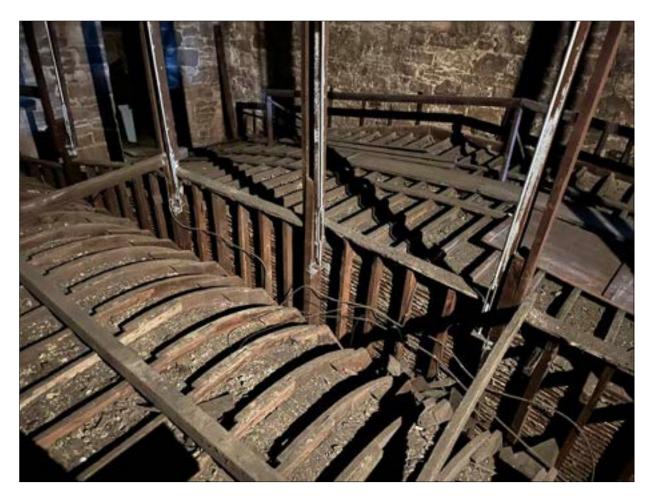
Catwalk over the proscenium arch, where an additional plaster collapse occurred. Concentrated foot traffic in this location renders it more prone to applied forces and, correspondingly, to damage.
